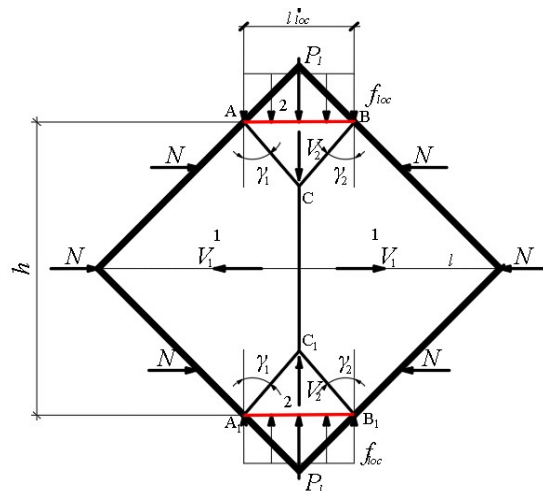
Kinematically possible scheme of the failure of a square reinforced masonry specimen with diagonal loading
